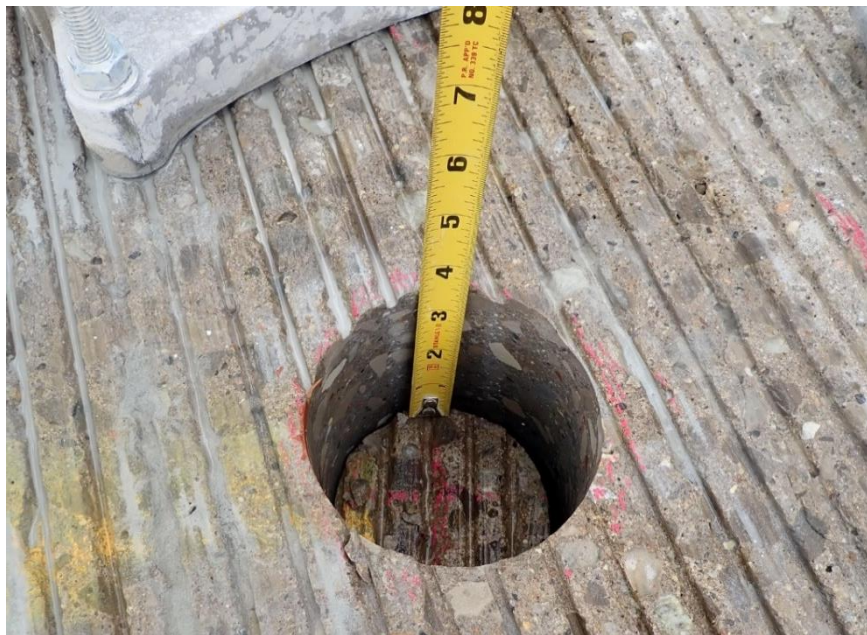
Measured drop (3.5 inches) of Core 1 of Bridge 5126.5S078.
